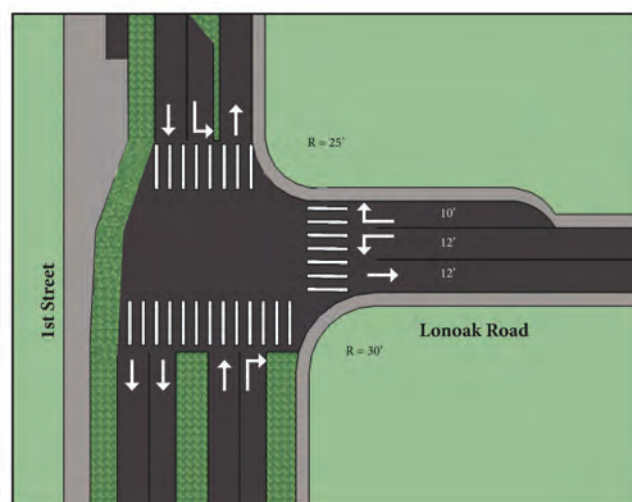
Intersection of Lonoak Road and First Street - schematic design
